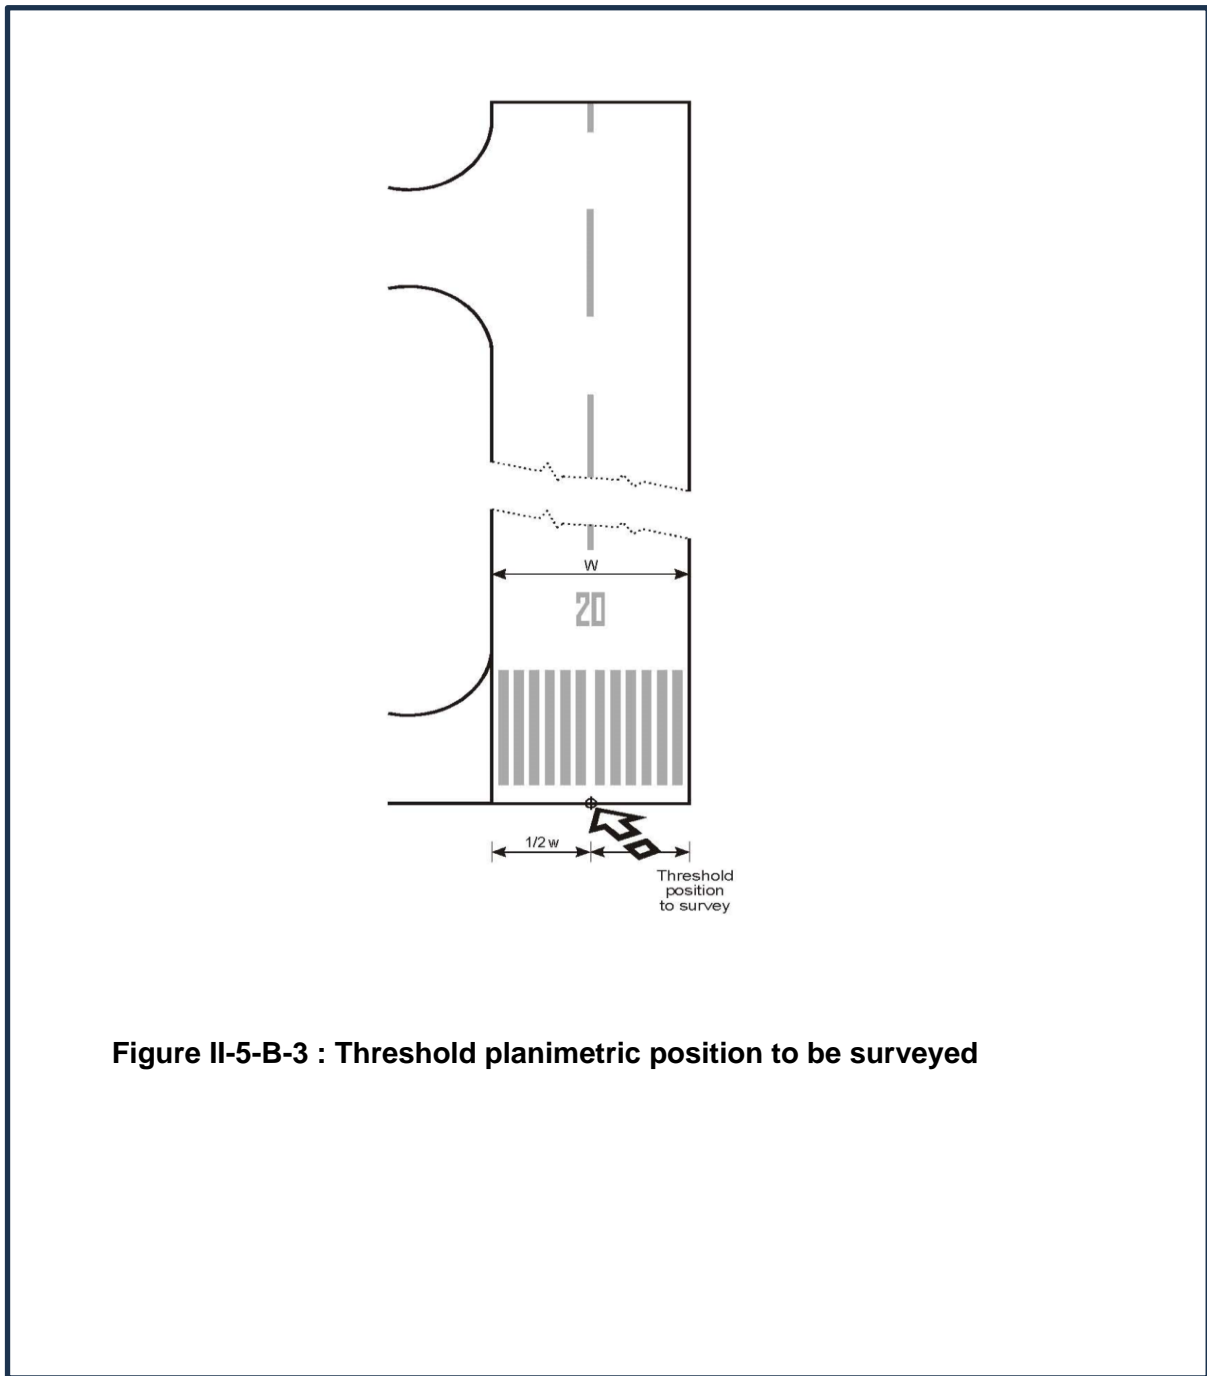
B-3 : Threshold planimetric position to be surveyed
